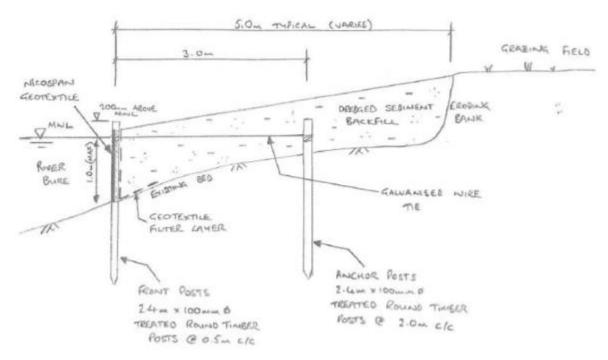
Typical construction cross section with Nicospan and backfilled sediment
